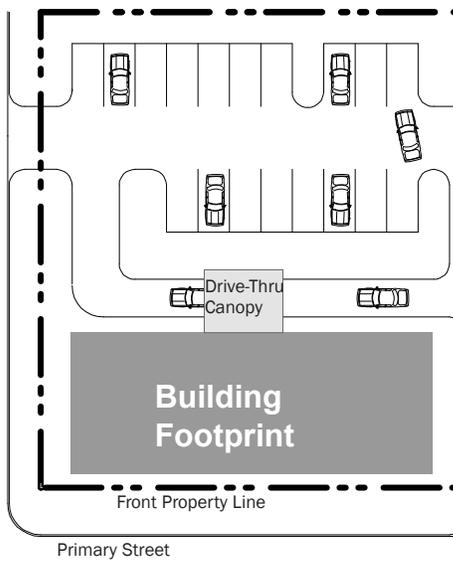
(8). Recommended Drive-Through Facility Layout.
